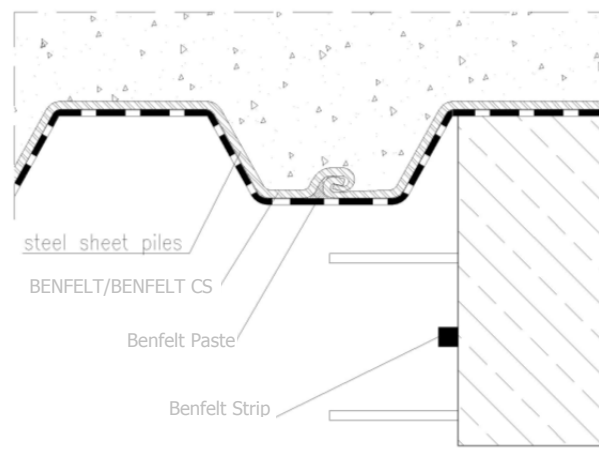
Detail of sealing of the steel sheet pile joint - top view.
